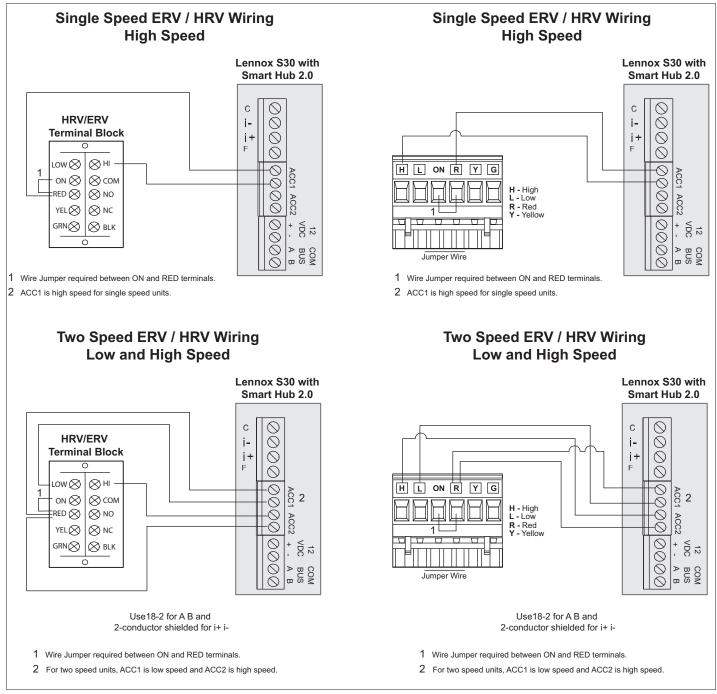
Lennox E30 to Ventilation Equipment Wiring Connections
